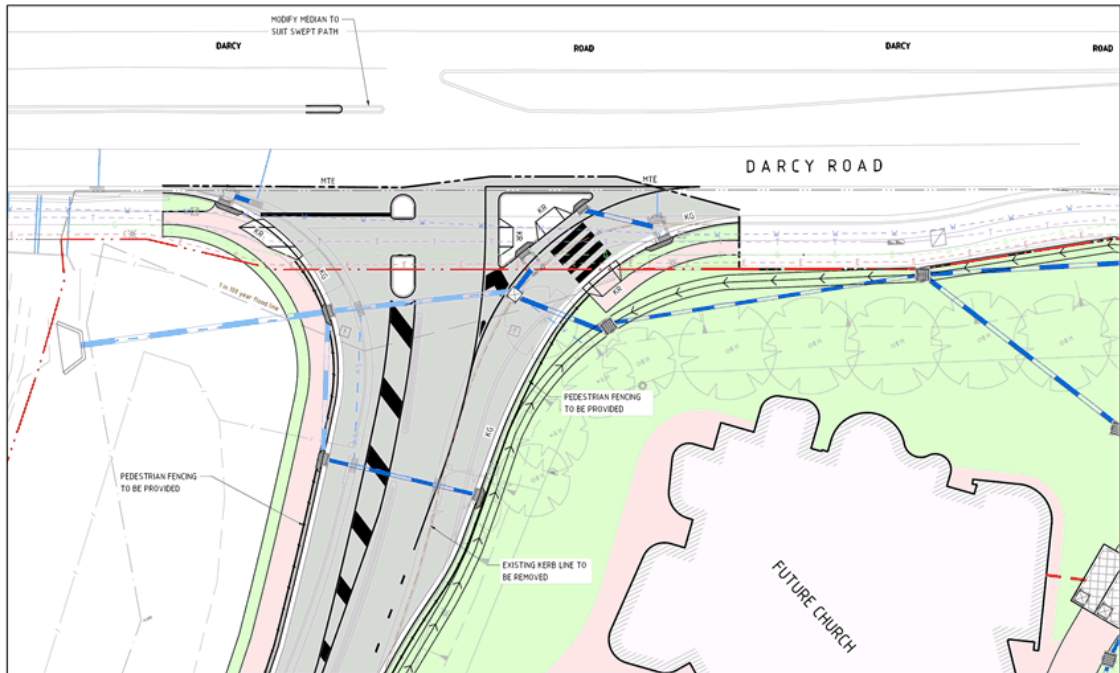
A concept design of the proposed intersection works at the access road and Darcy Road intersection.
